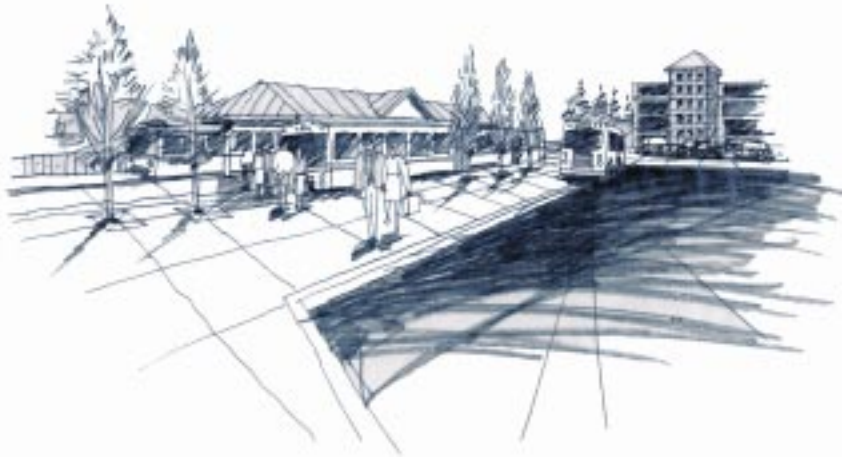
Illustration of the University Station. Visible is the light rail platform on the left and new parking structure in the background. Buses will drop-off and pick up passengers on the ground level of the structure and exit via a drive running past the platform.
